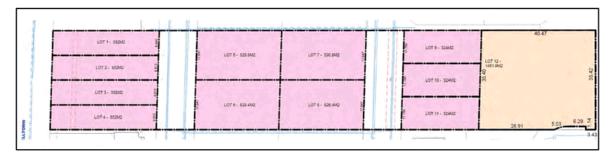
Extract of the Proposed Subdivision Plan demonstrating that Lots 1, 2, 3, 4, 9, 10 and 11 do not comply with the lot size control; the remaining proposed lots are well above the lot size control
